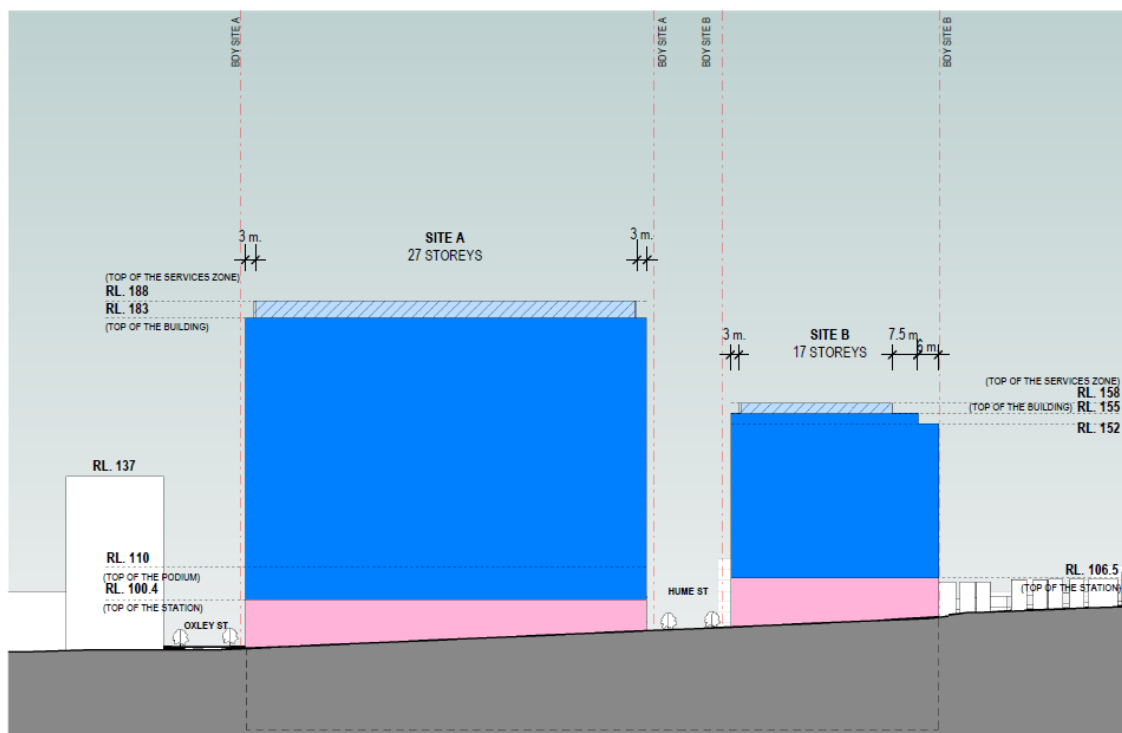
A: Proposed Crows Nest OSD building envelopes – west elevation (Pacific Highway)
